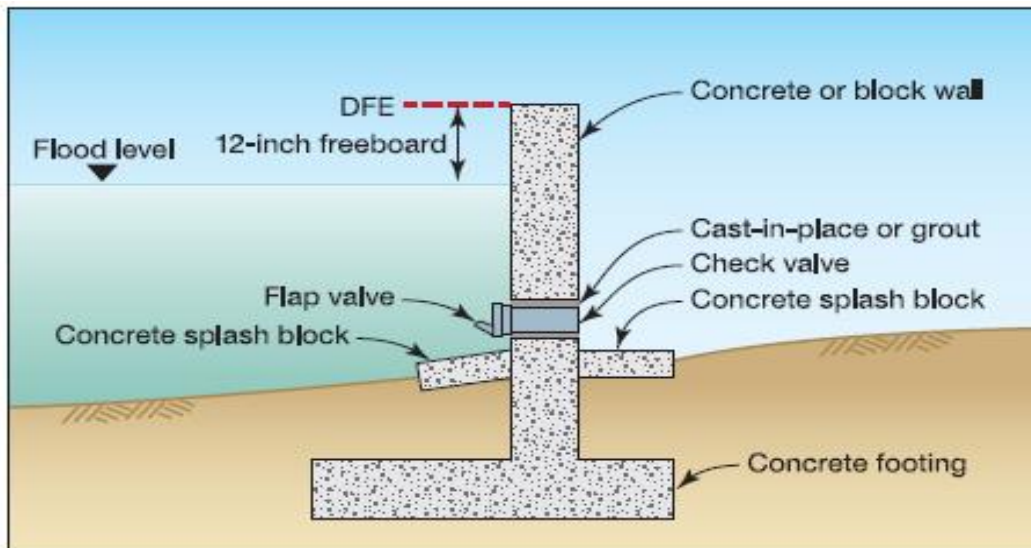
Constructing New Concrete Floodwall with or Without Movable Flood Panels
